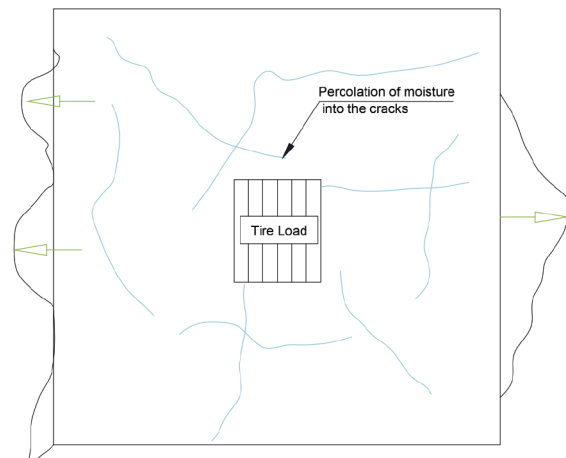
Plan of pavement with crack propagation at subgrade failure under traffic cyclic loading [2]
